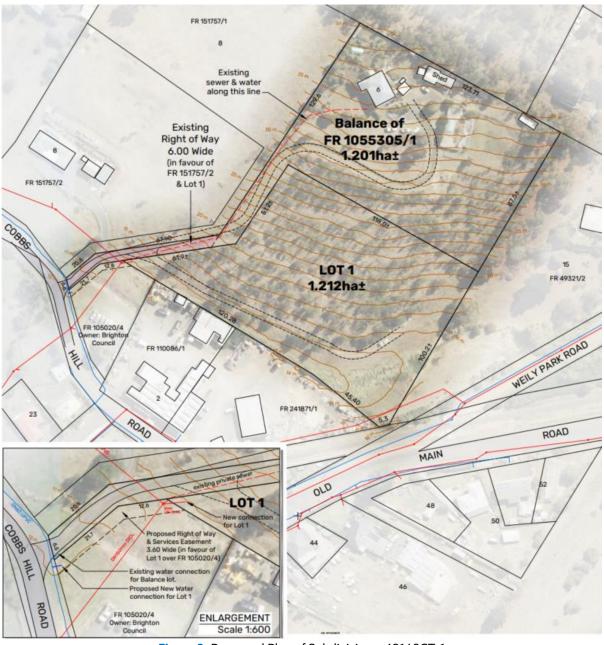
Proposed Plan of Subdivision - 49168CT-1
